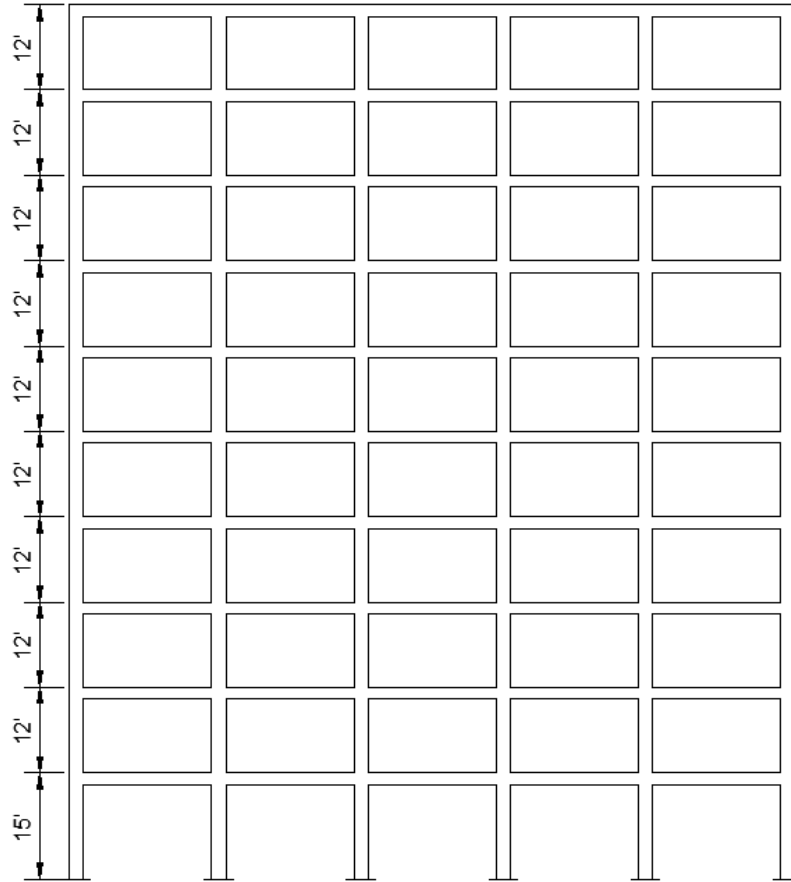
Elevation view of prototype building along column line 1 (Lew et al. 2014)
